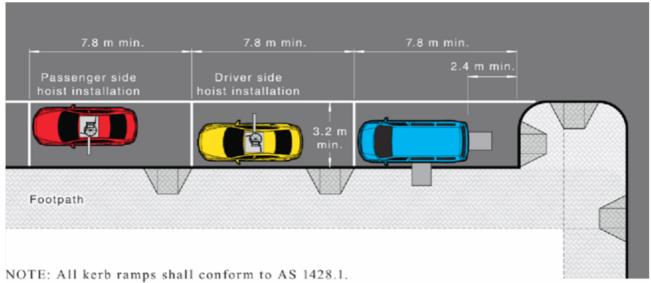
Compliant Design Options for Accessible Parallel Parking Bays (On-street)
